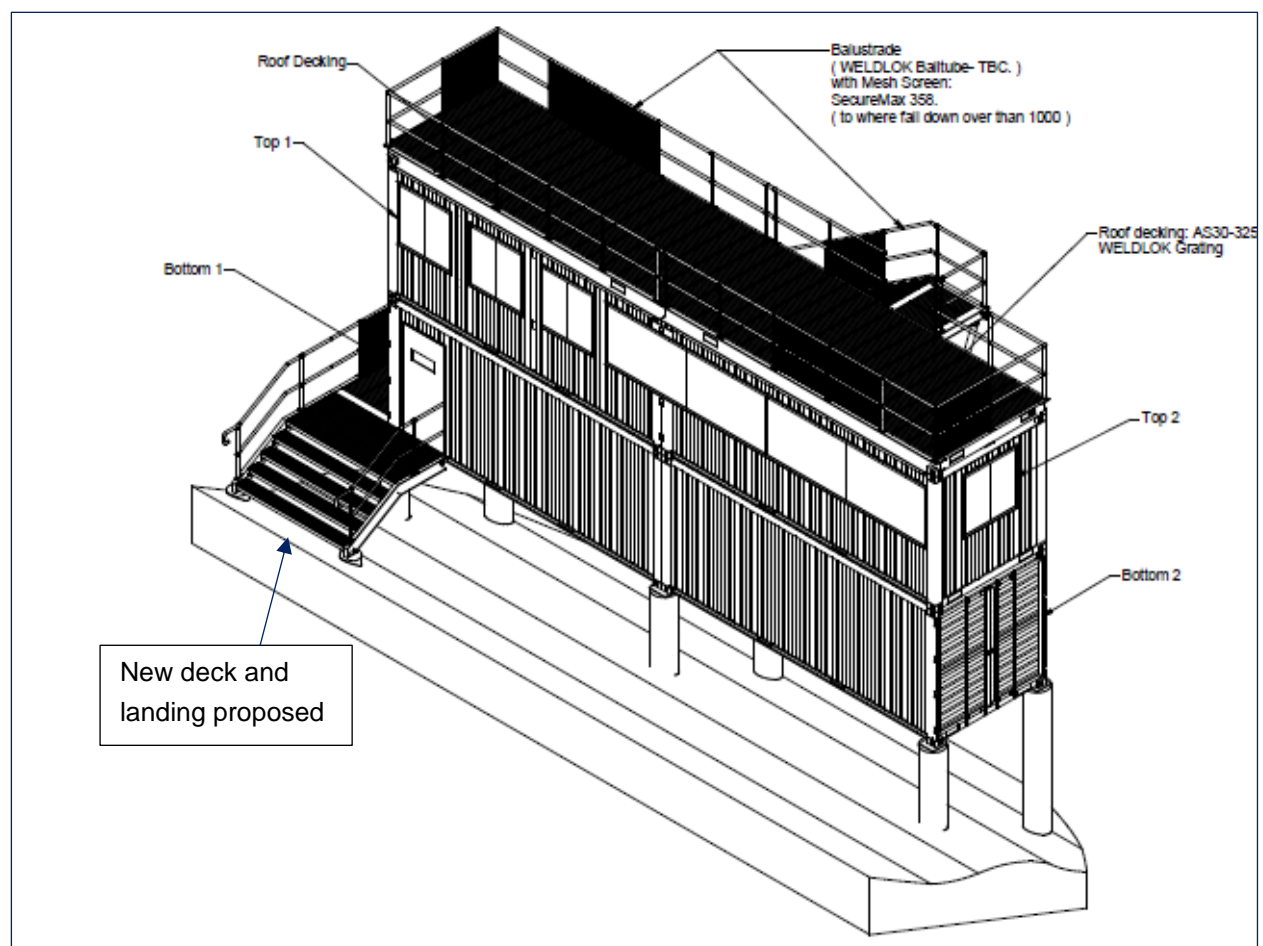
| View of the proposed judging structure (Source: Applicant's documentation)
